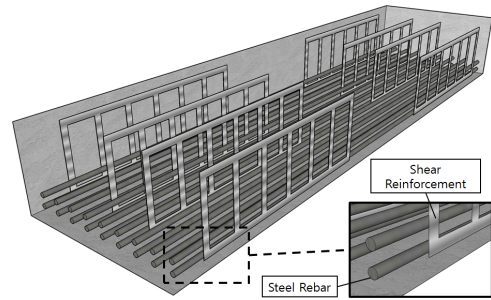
Schematic view of a wide beam reinforced with steel plate
